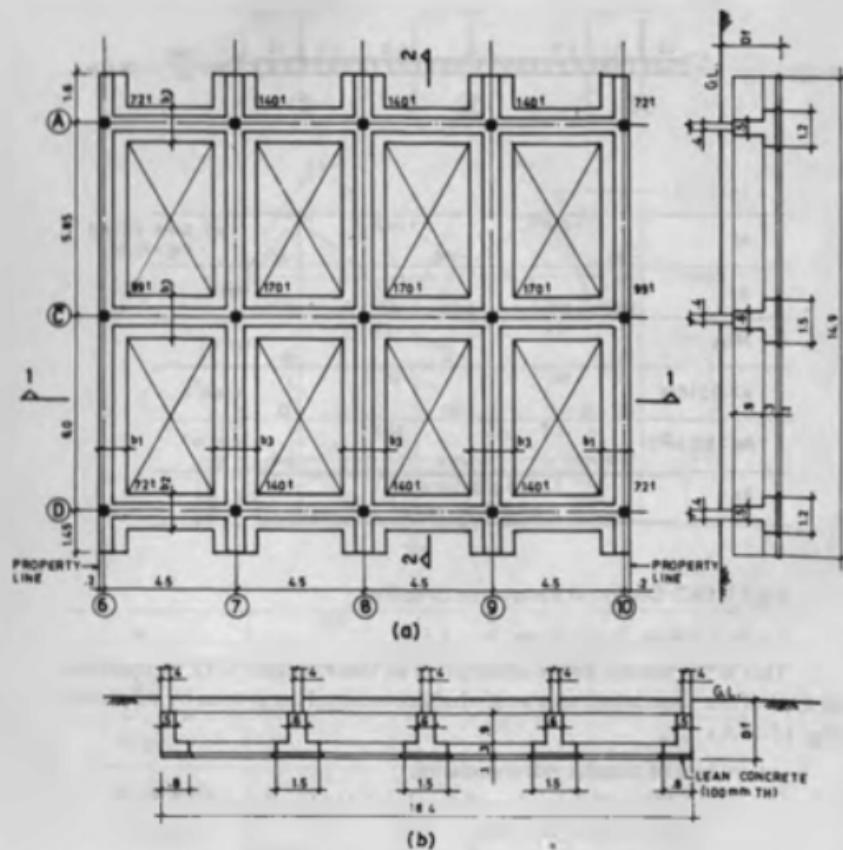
A. Plan and sections of an annular raft foundation. (a) Plan of annular raft (all columns 0.4×0.4); (b) Section 1-1; (c) Section 2-2.
